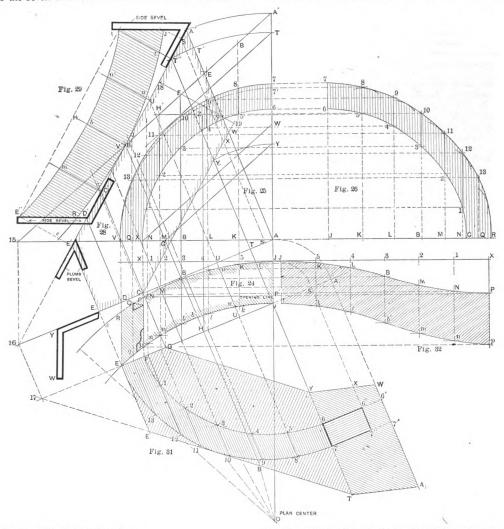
Plan of Half Rib of Sash Fig. 25 -Elevation of Half Rib of Sash. Fig. 26.—Developed Falling Mold for "Convex Surface" or
